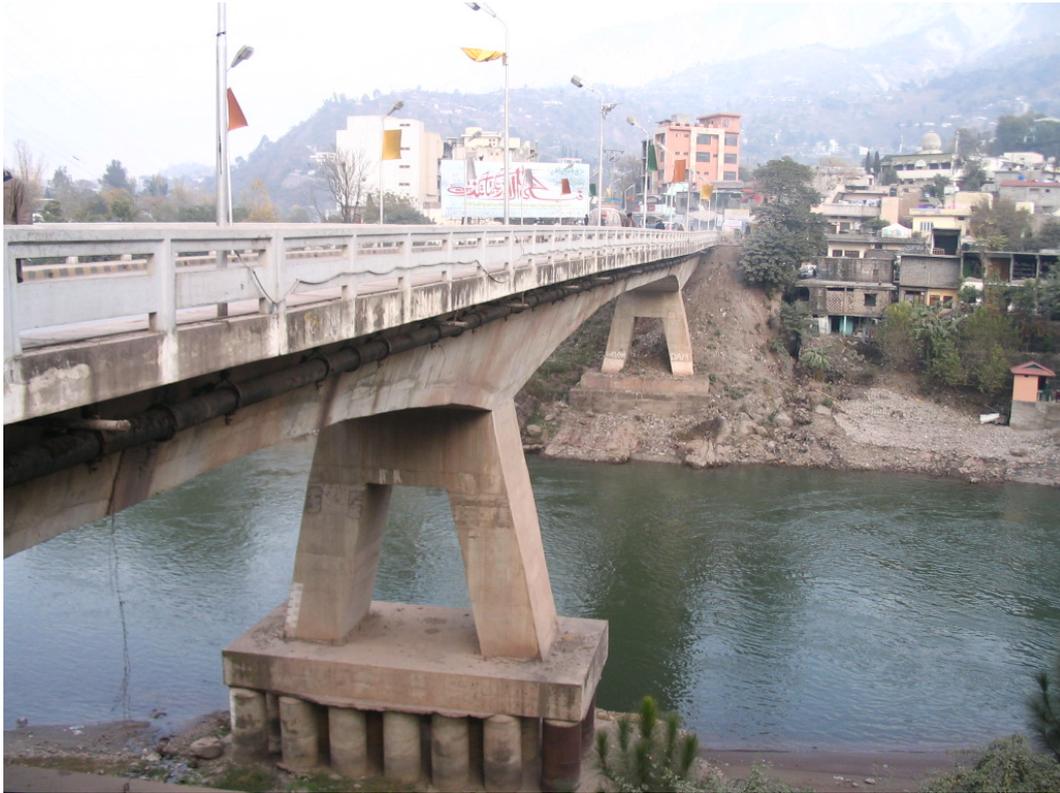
Undamaged vehicle bridge across Jhelum River in Muzaffarabad. RC bridge deck, multi-span with integral abutments supported on RC piles with steel casing
